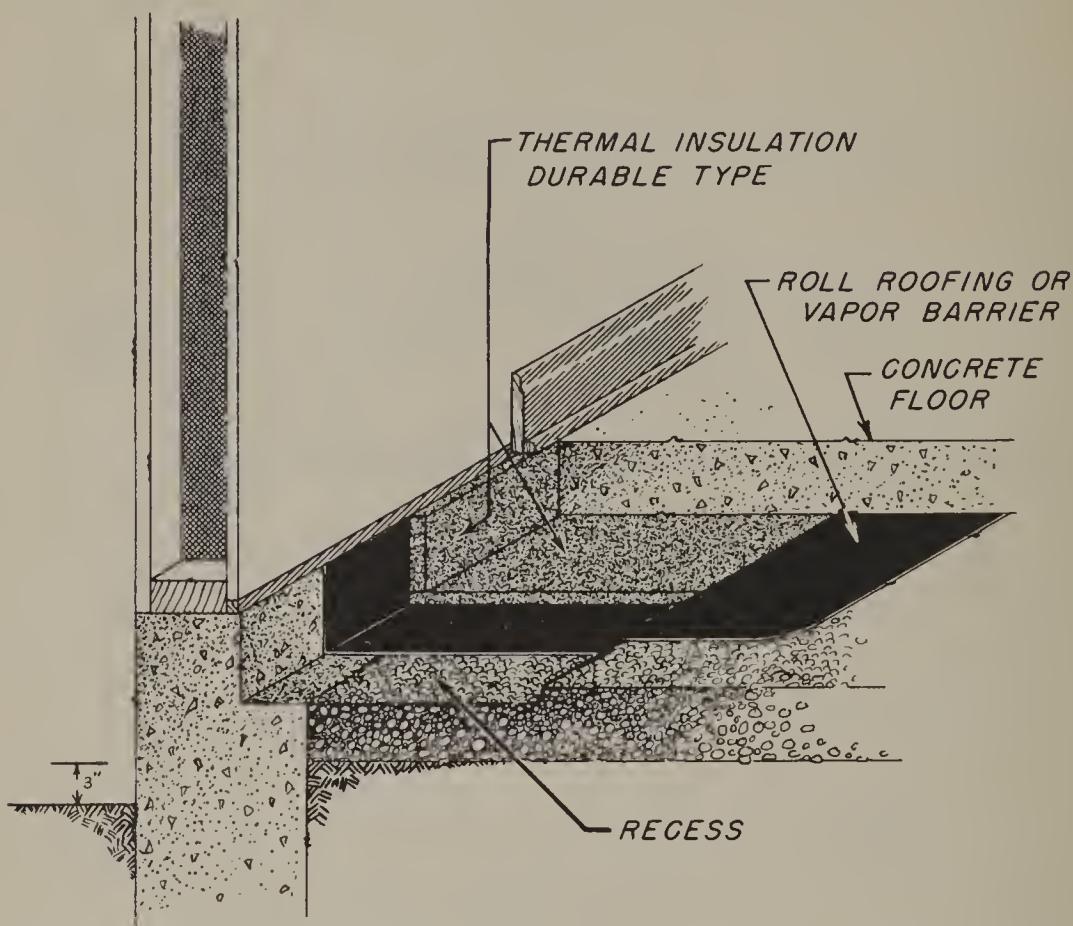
Basementless house, concrete slab floor.* When concrete floors are laid directly on the soil, condensation may occur on the concrete floor in either winter or summer. Condensation in the winter will occur when temperatures are low out-of-doors and the temperature of the surface of the concrete along the walls is also low because of the relatively high thermal conductivity of the concrete wall and slab. When the temperature of the concrete slab falls below the dew point of the water vapor in the adjacent atmosphere, condensation will occur. Condensation control is had by breaking the continuity of the concrete and permitting the floor to rise to a higher temperature. Thermal insulation having at least a resistance value (R) of 2.0 should be provided about 1 foot 6 inches wide around the perimeter of the concrete slab and should extend up over the edge of the slab. The insulation should be of a waterproof type or thoroughly covered with a heavy coating of asphalt. A recess in the concrete along the wall and in the gravel fill should be provided in which the insulation can be laid. Heavy roll roofing or durable vapor-barrier type paper should be spread over the gravel before laying the finished concrete floor in order to prevent seepage of water from the soil. Floors laid directly on the soil are affected by soil temperatures that are normally lower than average air temperatures in summer. This tends to favor summer condensation, especially when a building is new and before soil temperatures below the building are materially raised by the previous heating season. Unfortunately there is no construction detail that will materially assist in controlling summer condensation. The use of a low density concrete with vermiculite as part of the aggregate or the use of thermal insulation below the floor would reduce the possibility of such difficulties.
